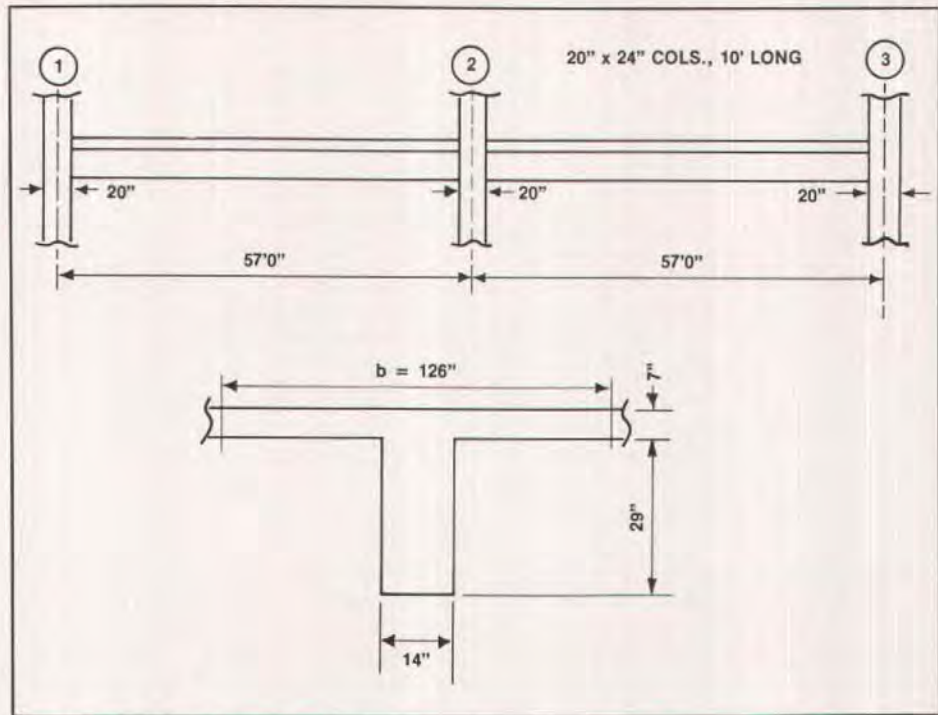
Two-span T beam parking structure.<sup>4</sup>
